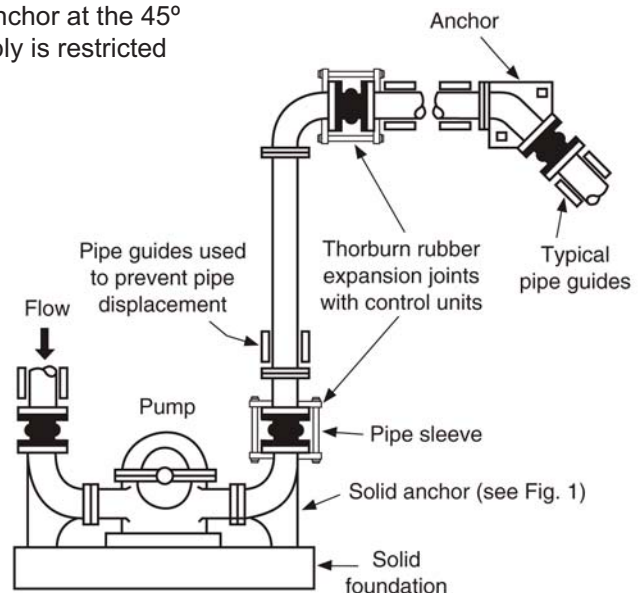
Typical piping layout showing the use of control units with the expansion joints when proper system anchoring is limited
